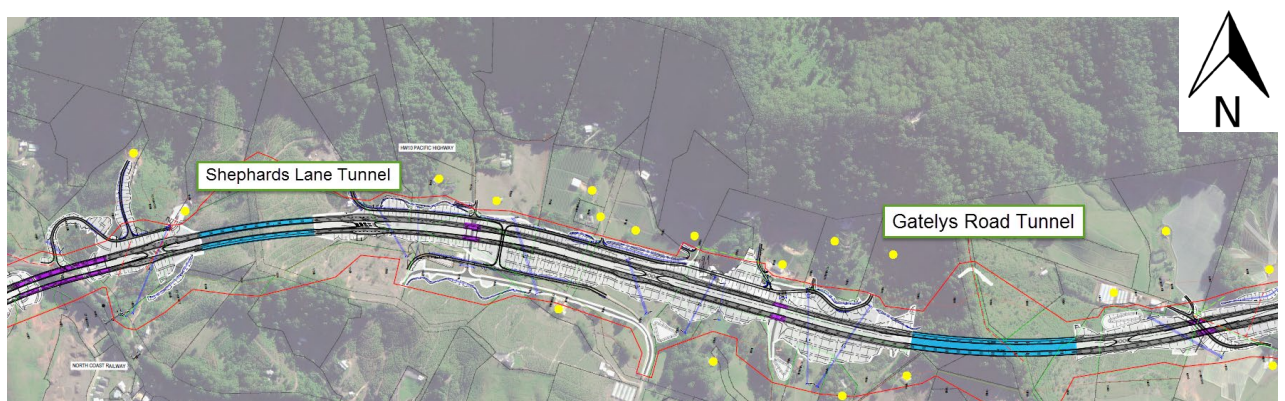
Location and orientation of Shephards Lane and Gatelys Road tunnels.
